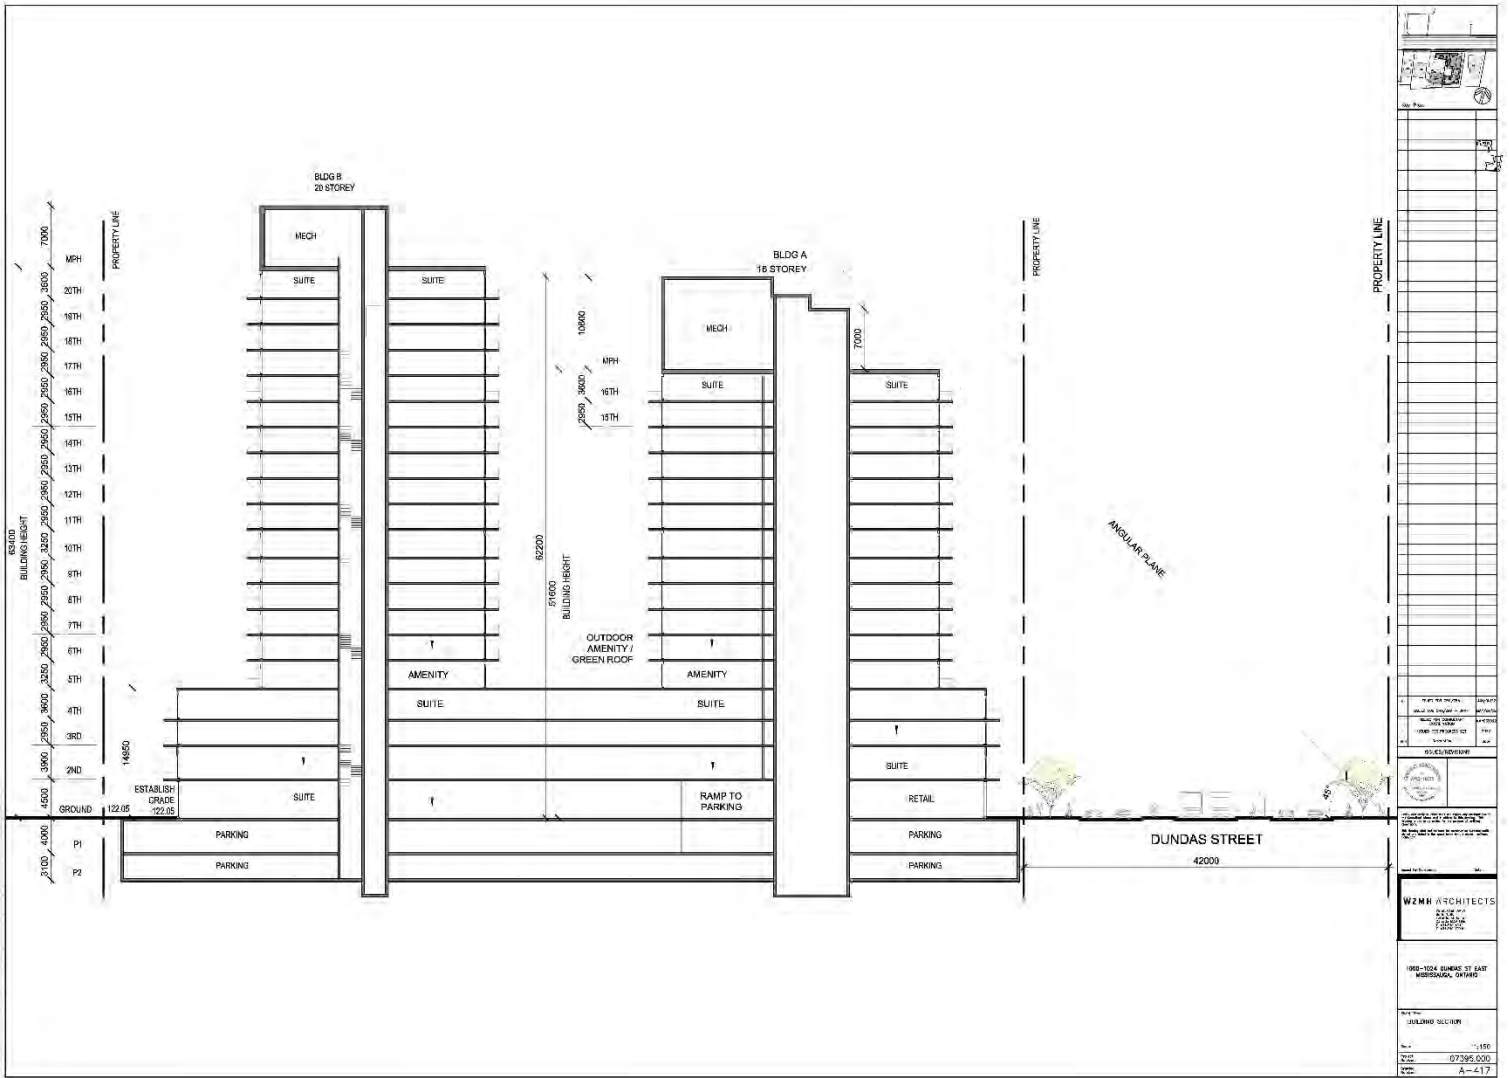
WZMH Architects Inc. Building Section Plan Showing 45 Degree Plane Height Measurement
